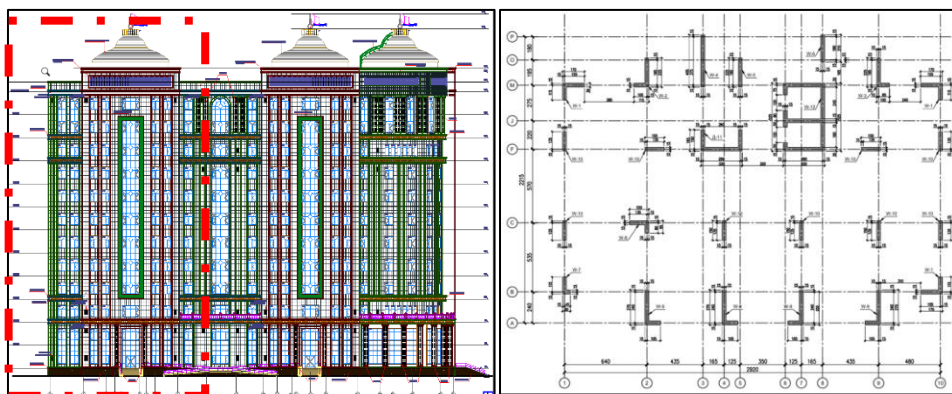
(a) Elevation of building and (b) wall arrangement for all floors
